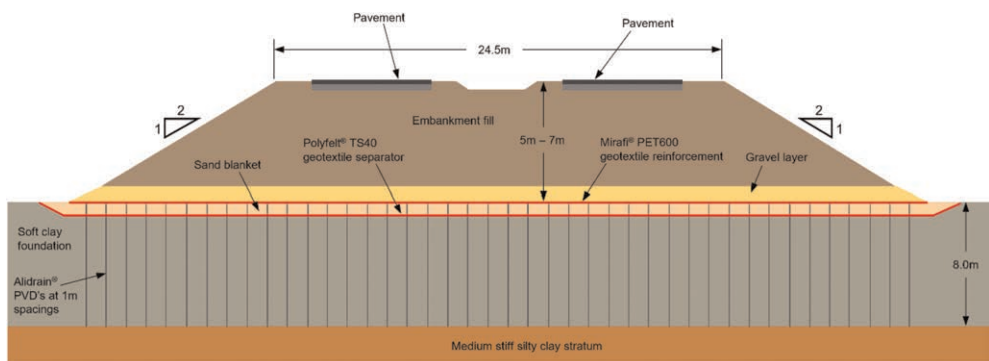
Typical cross section of the reinforced embankment in CLLEEx project.
